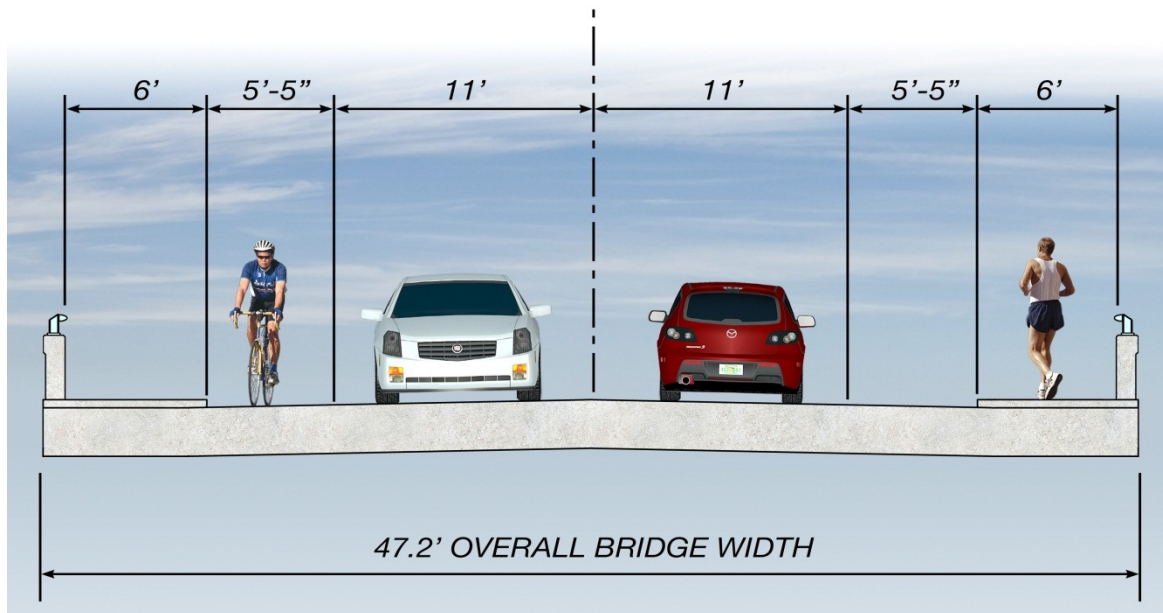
Proposed Low-Level Movable Bridge Typical Section
